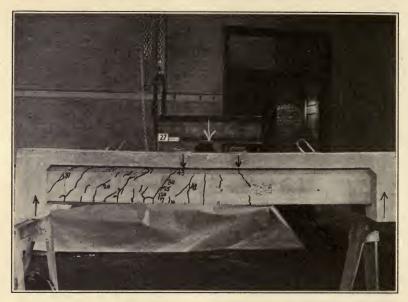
Beam No. 27, Showing Principal Cracks at Left End, and the Crushing of the Concrete at the Rod.
